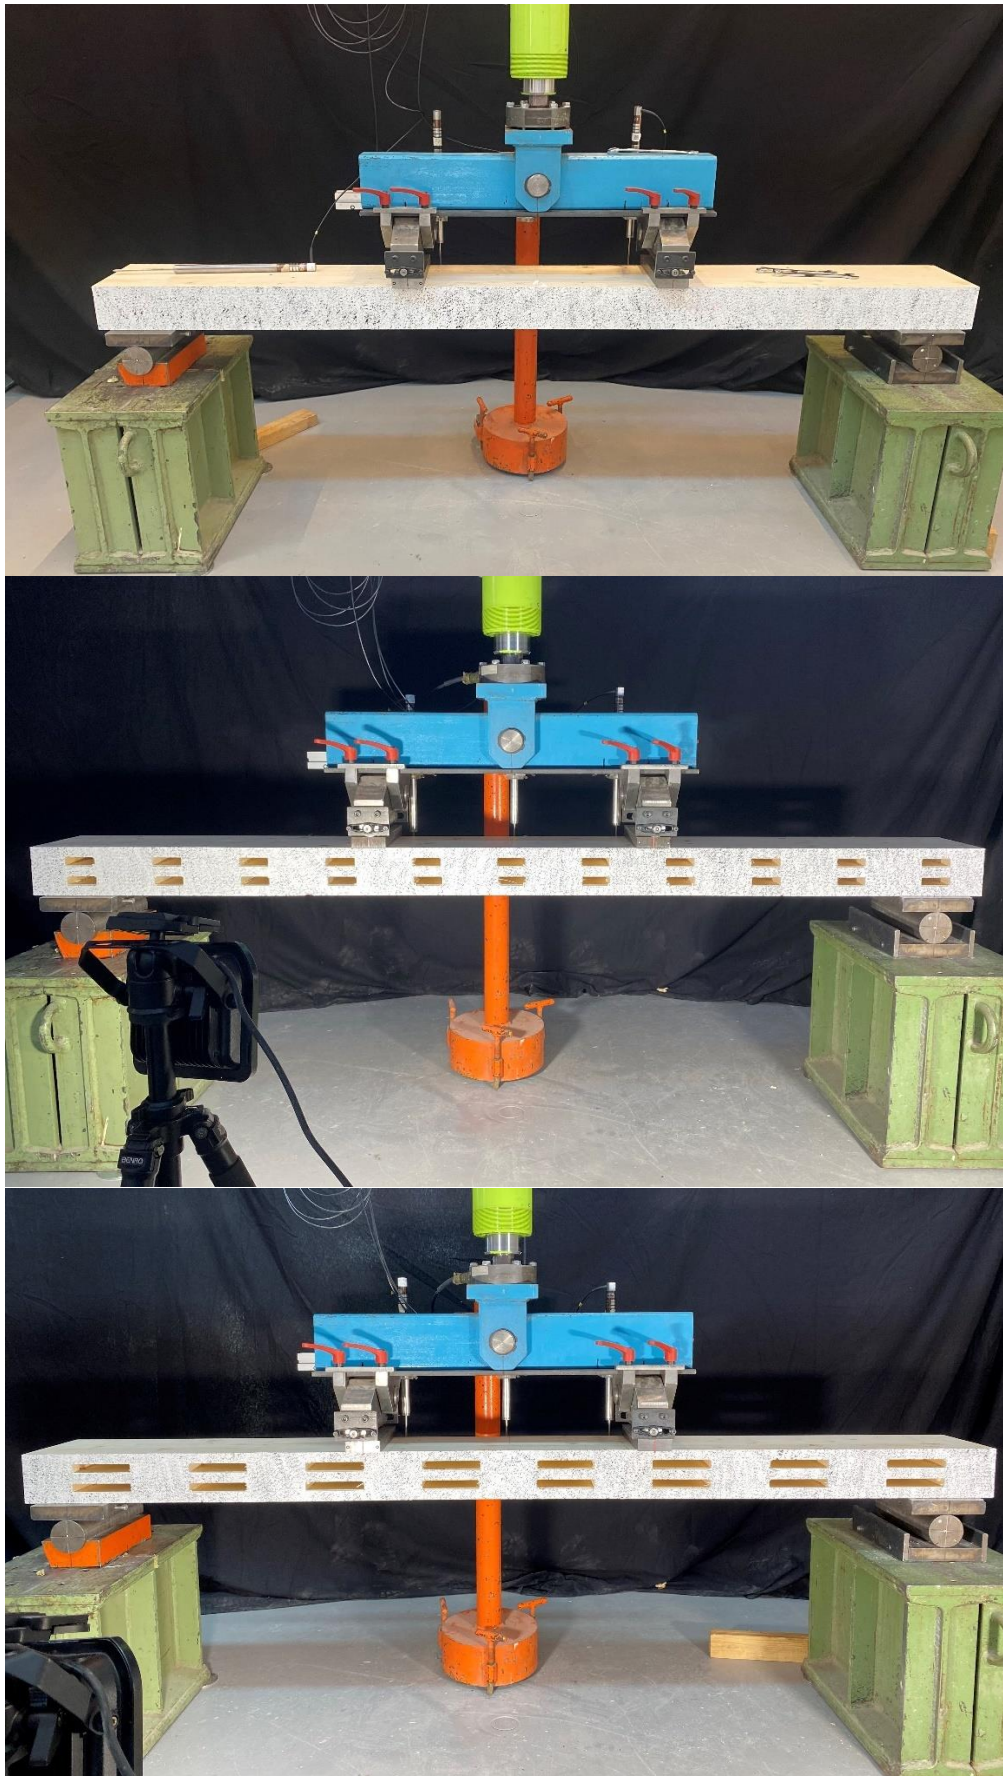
The setup of the equipment of the beam and location of the load with regard to the arrangement of airgaps.
